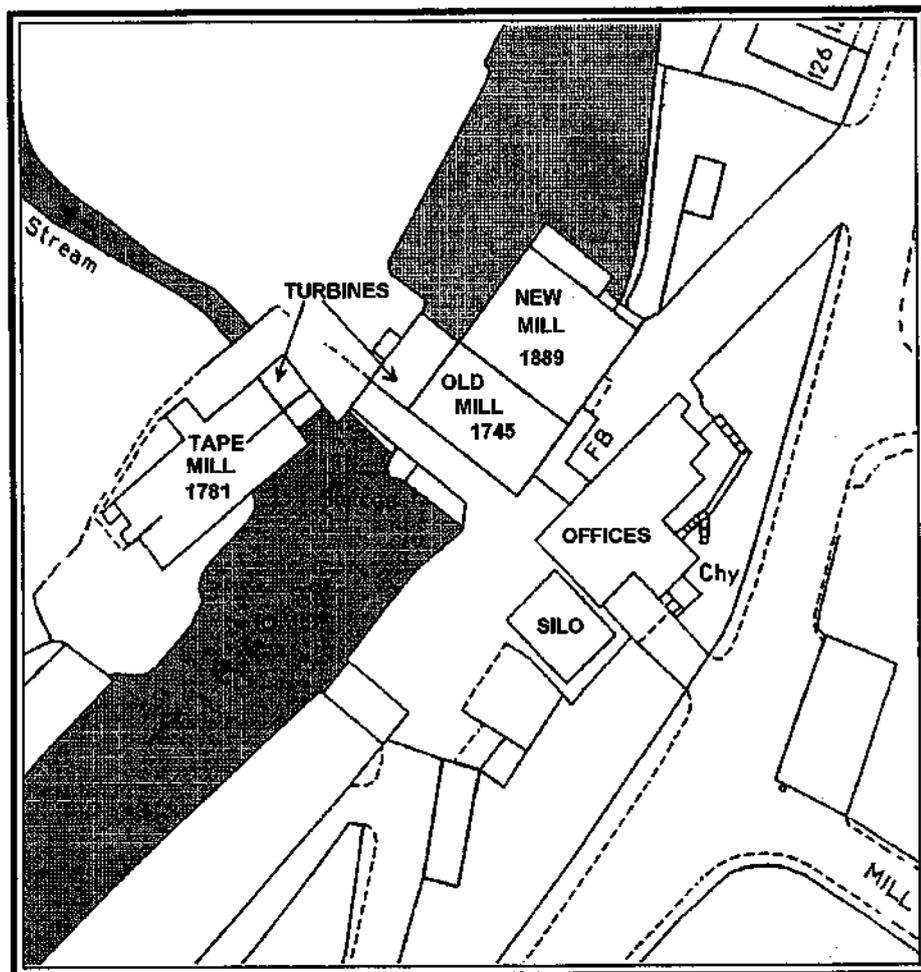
Plan of Winshill Mill site showing the old corn mill of 1745, the new corn mill of 1889 and the cotton or tape mill of 1781.
